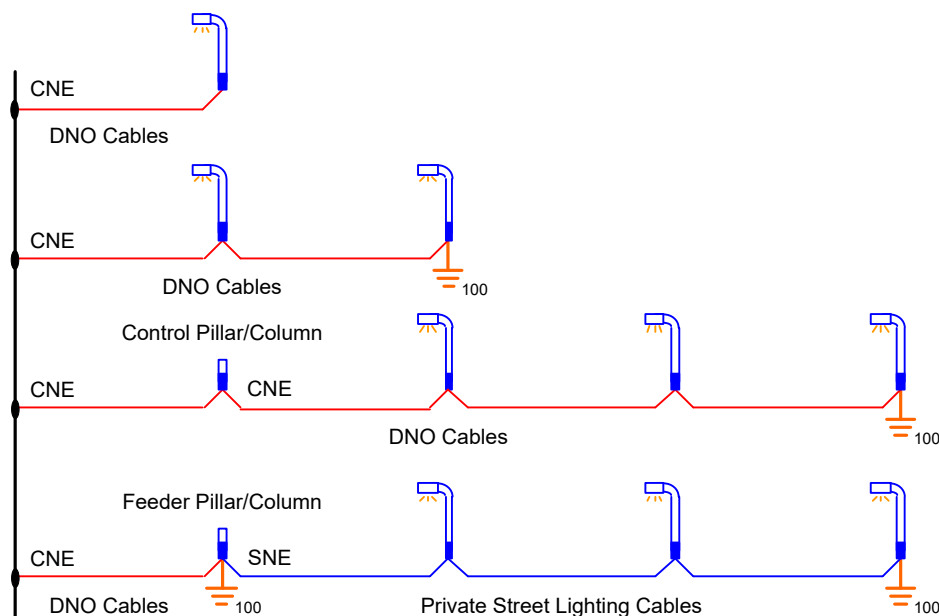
Examples of Street Lighting Earth Electrode Positions
